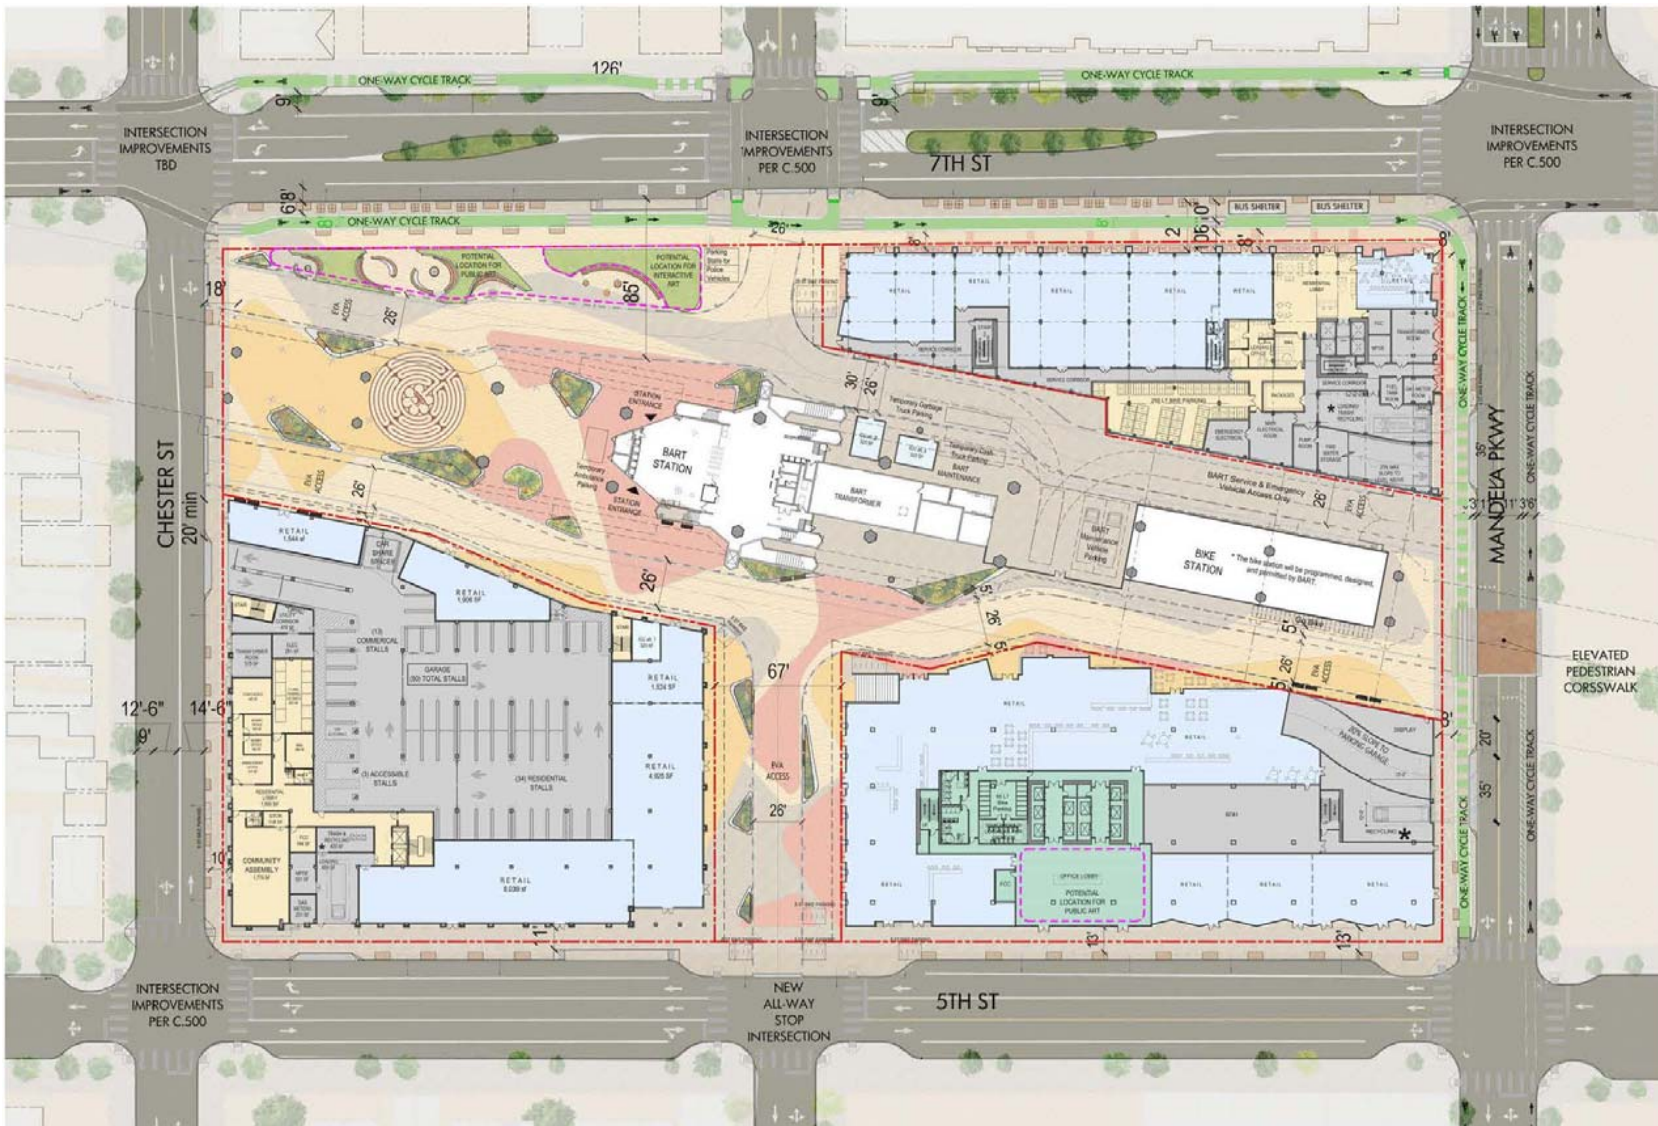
Floor Plan, Ground Floor - 2020 Project (currently proposed)
